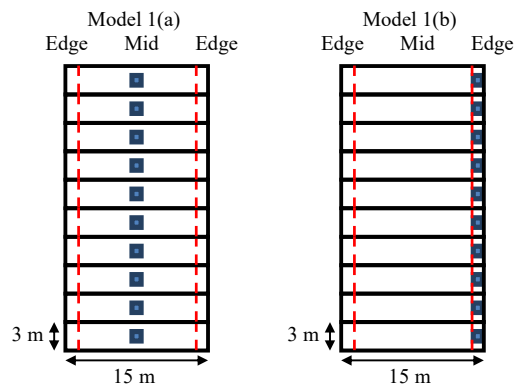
Dimension and windows layout for 10 stories structure (a) windows in the middle of structure, and (b) windows at the edge zone [9] of structure
